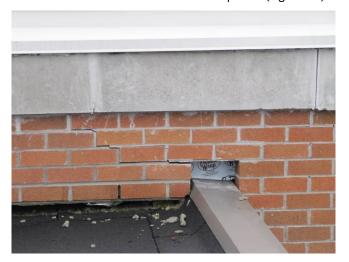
Loose bricks and cracked mortar joints at roof level.
